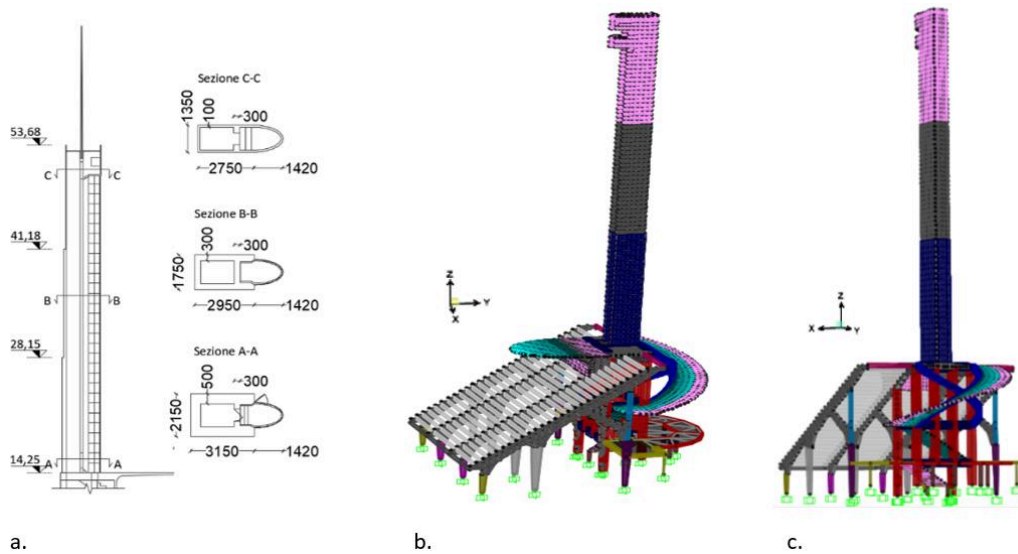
Vertical and cross sections of the Maratona tower (a); 3D perspective views of the finite element model of the tower and block 10<sup>th</sup> (b and c).
